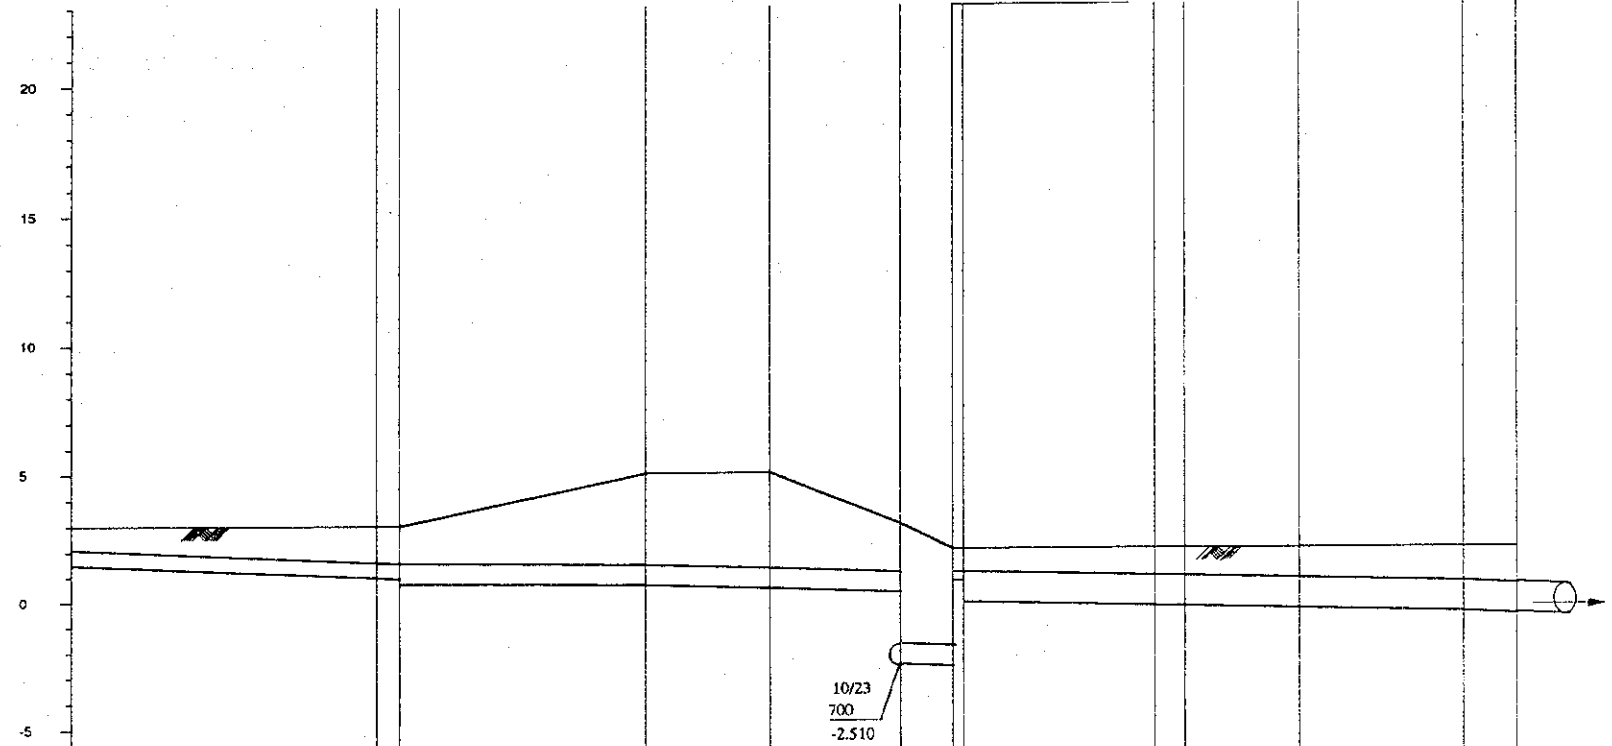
Longitudinal Profile of Proposed Sewer to Conceicao-2
